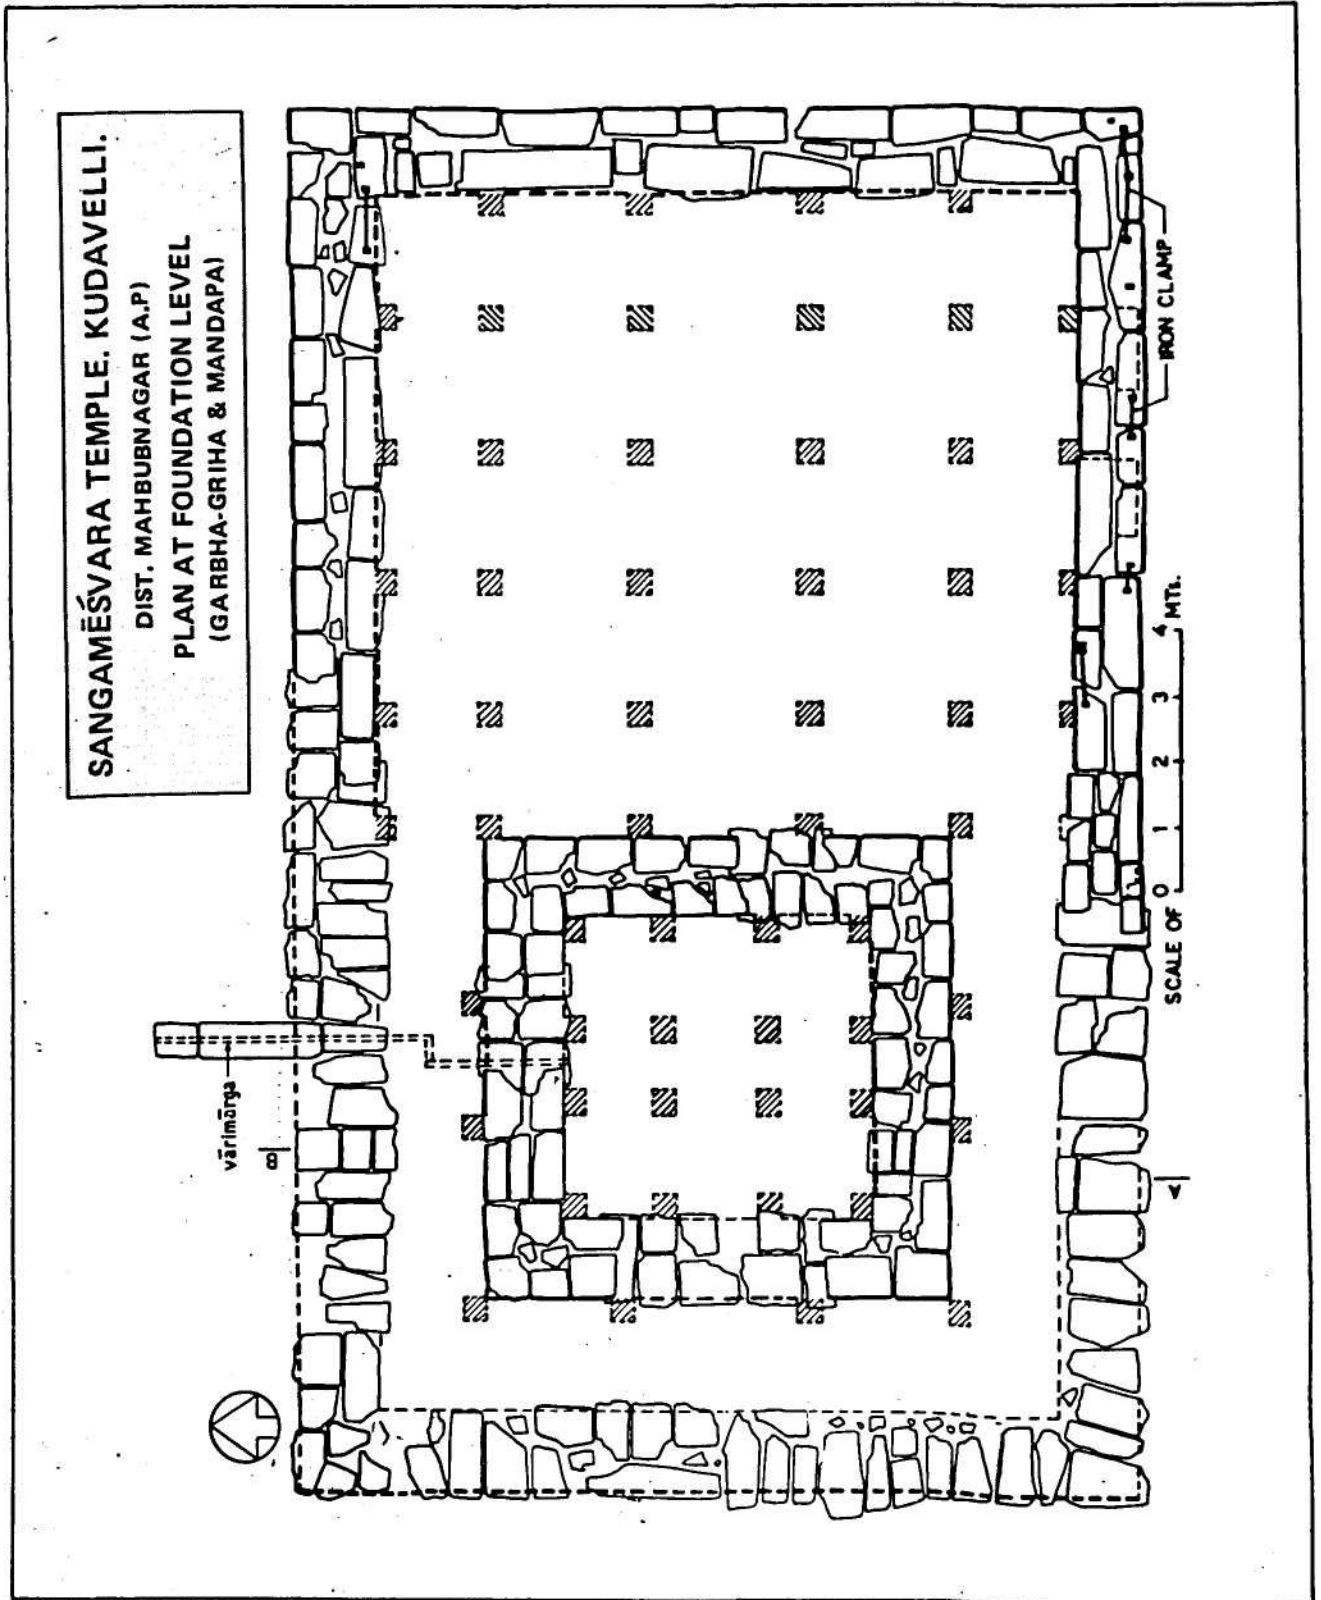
Kudavelli Dt. Mahbubnagar, Sangamesvara Temple: Plan at Foundation level (Garbha-griha and Mandapa).
